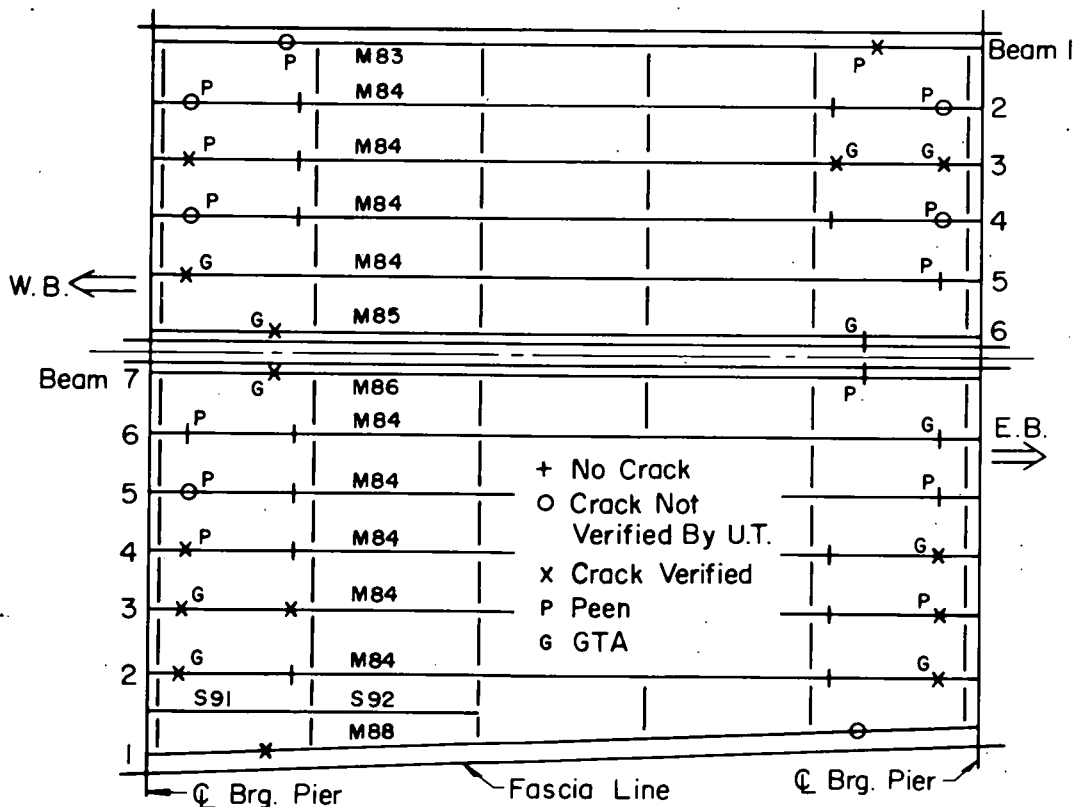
Repair methods as applied to span No. 10, Yellow Mill Pond Bridge
